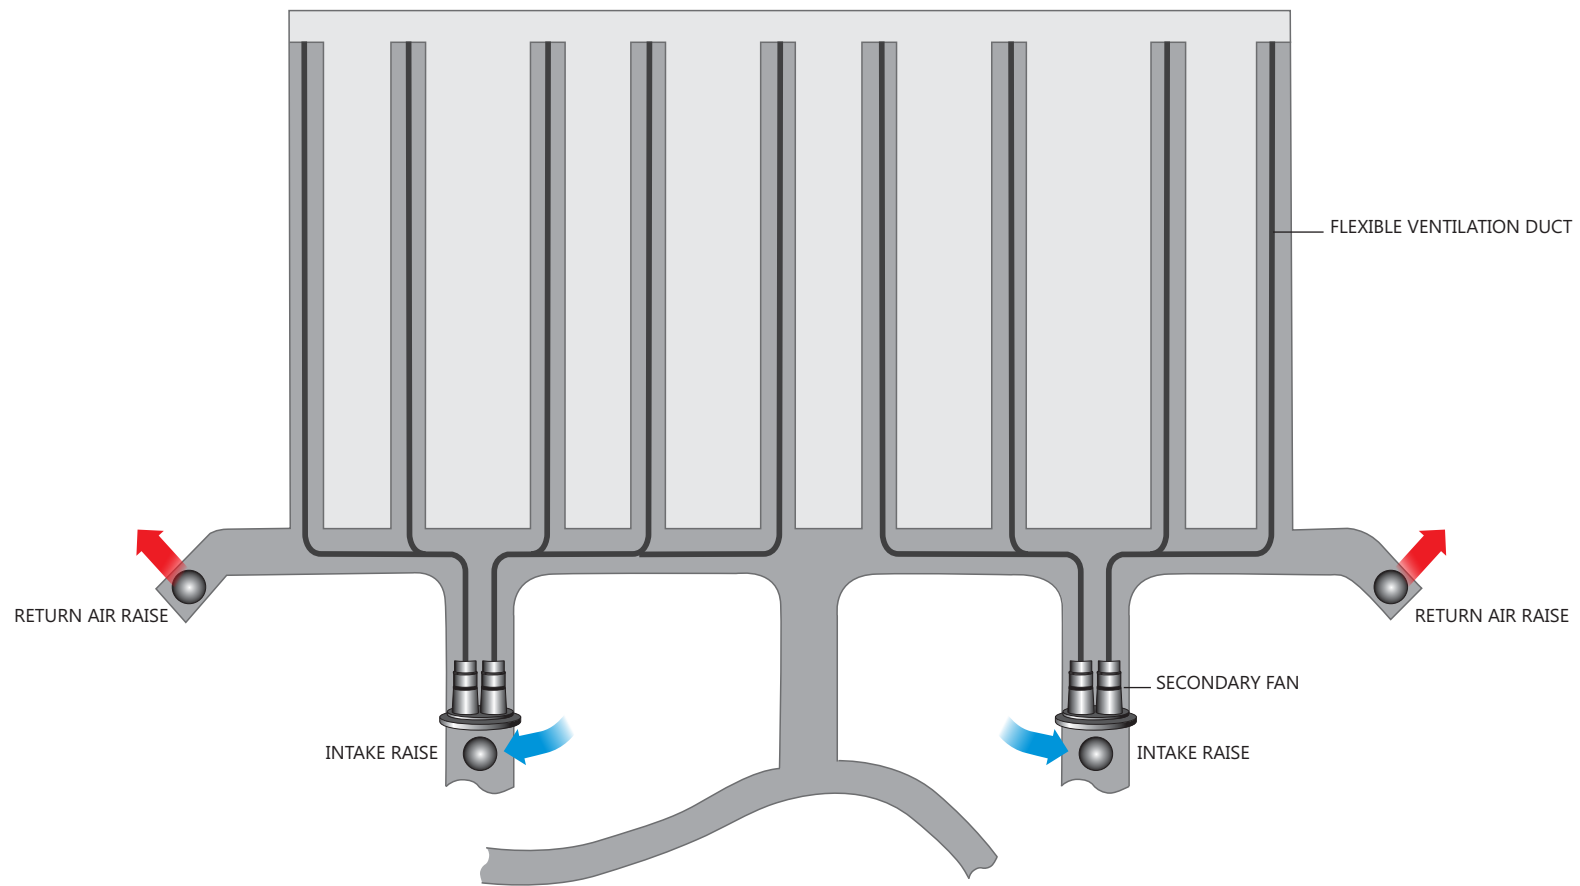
Schematic Mine Secondary Ventilation Layout
